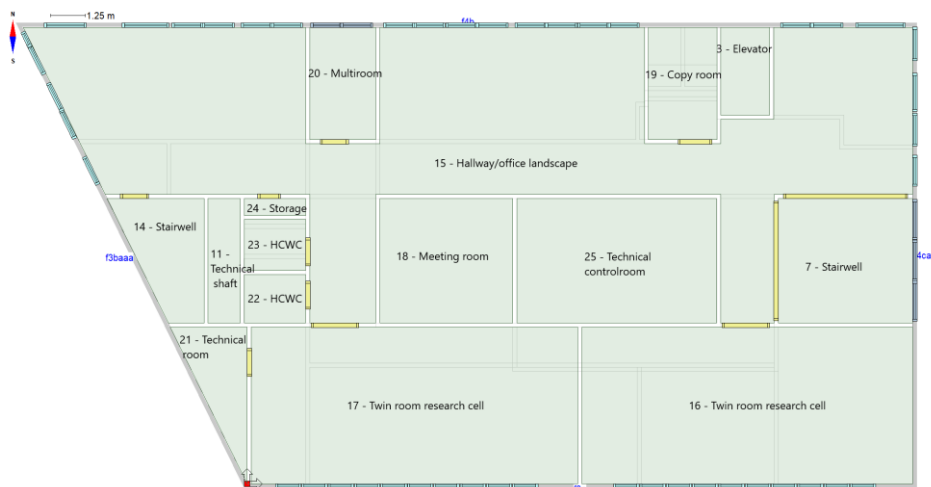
Floor plan of the 2nd floor at ZEB lab, clipped for BEM in IDA ICE
